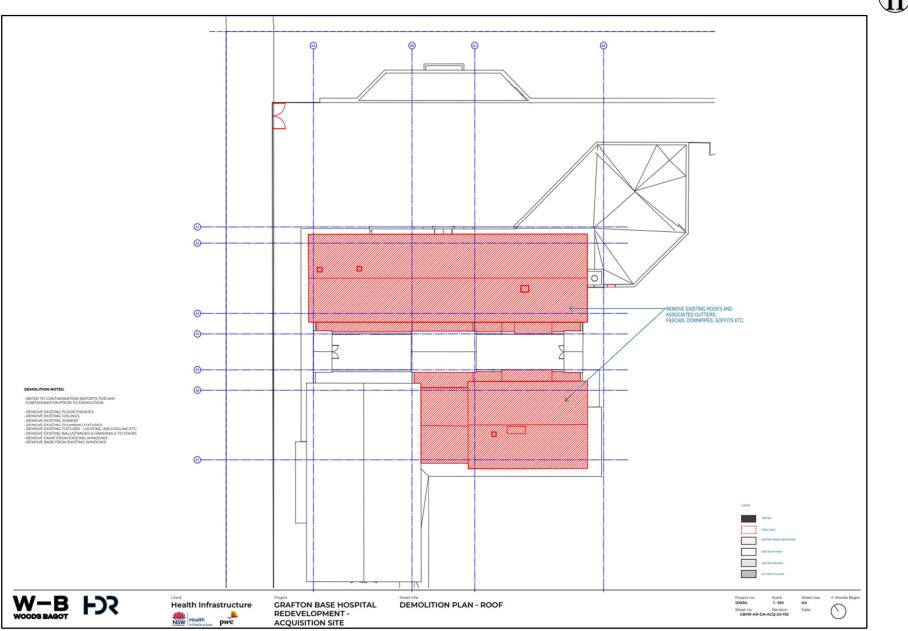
Grafton Correctional Centre Acquisition Site- Proposed demolition plan- roof
